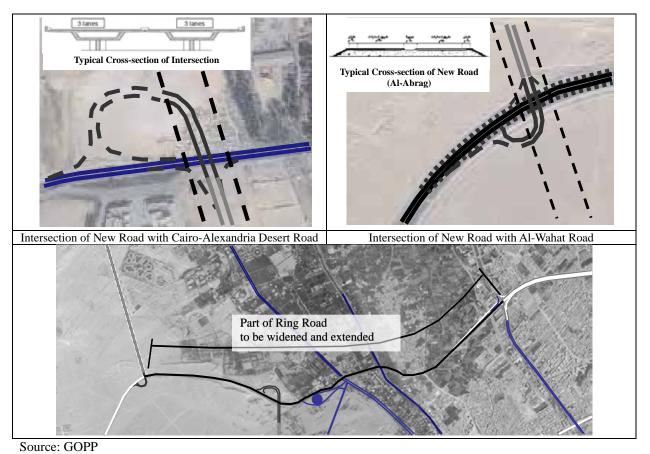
Connection of Cairo-Alexandria Desert Road with the Ring Road at km 21
